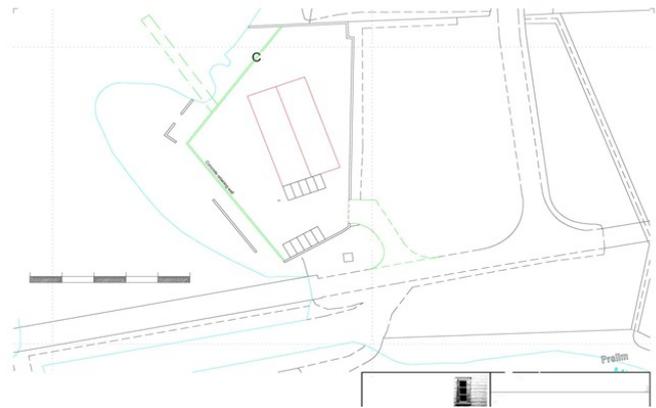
Plan view of Coplands' Dock site in relation to the new pier.
